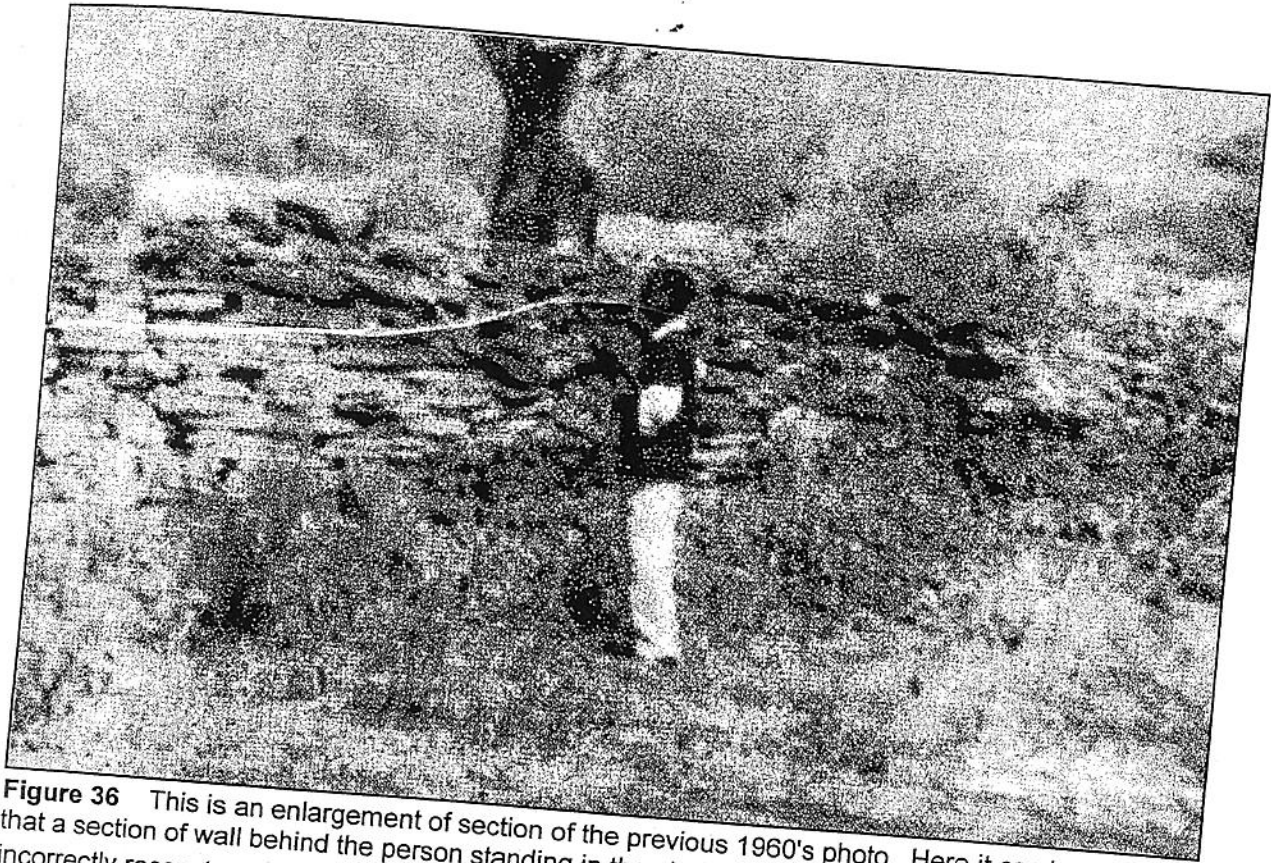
This is an enlargement of section of the previous 1960's photo. Here it can be seen that a section of wall behind the person standing in the photograph has collapsed. This was later incorrectly reconstructed as will be seen in the next figure. (Fig. 37)
